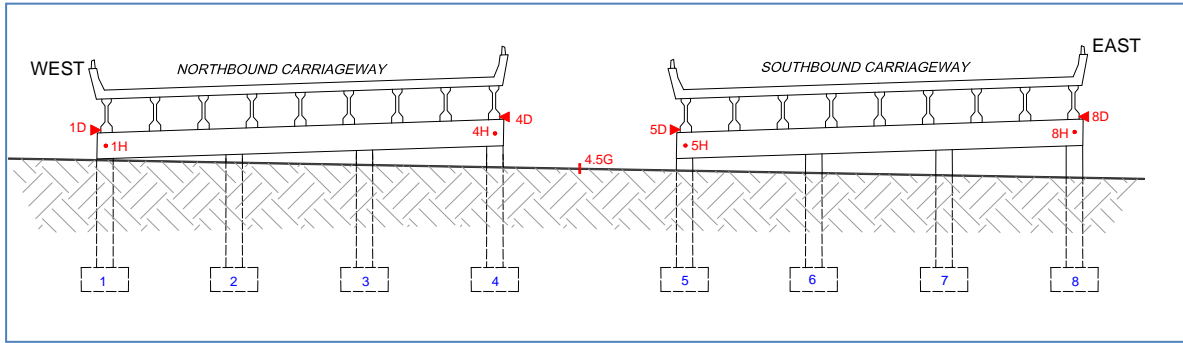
Bridge 2 - Abutment A – Relative 3D Monitoring Locations
